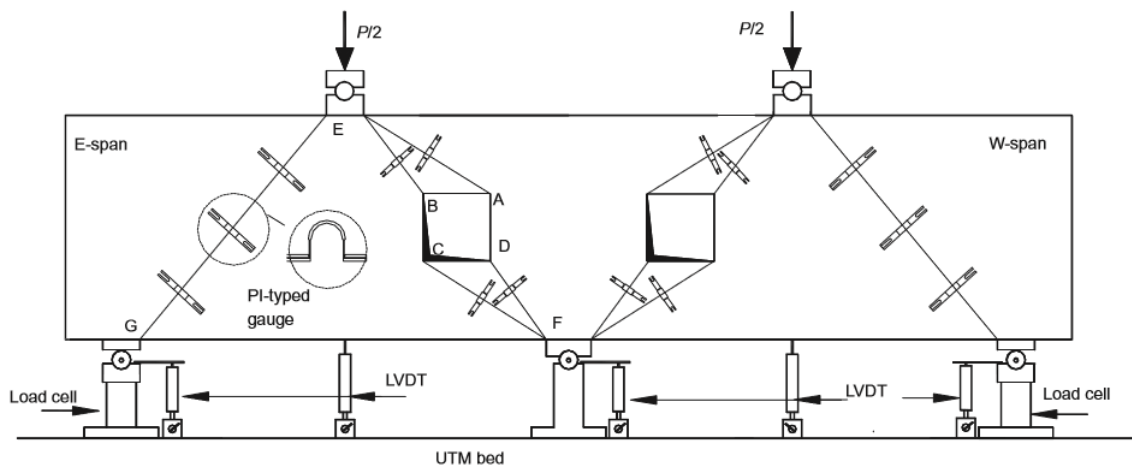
6IT1. Loading and instrumentation arrangements for test setup. Figure from report [Yang and Ashour].
